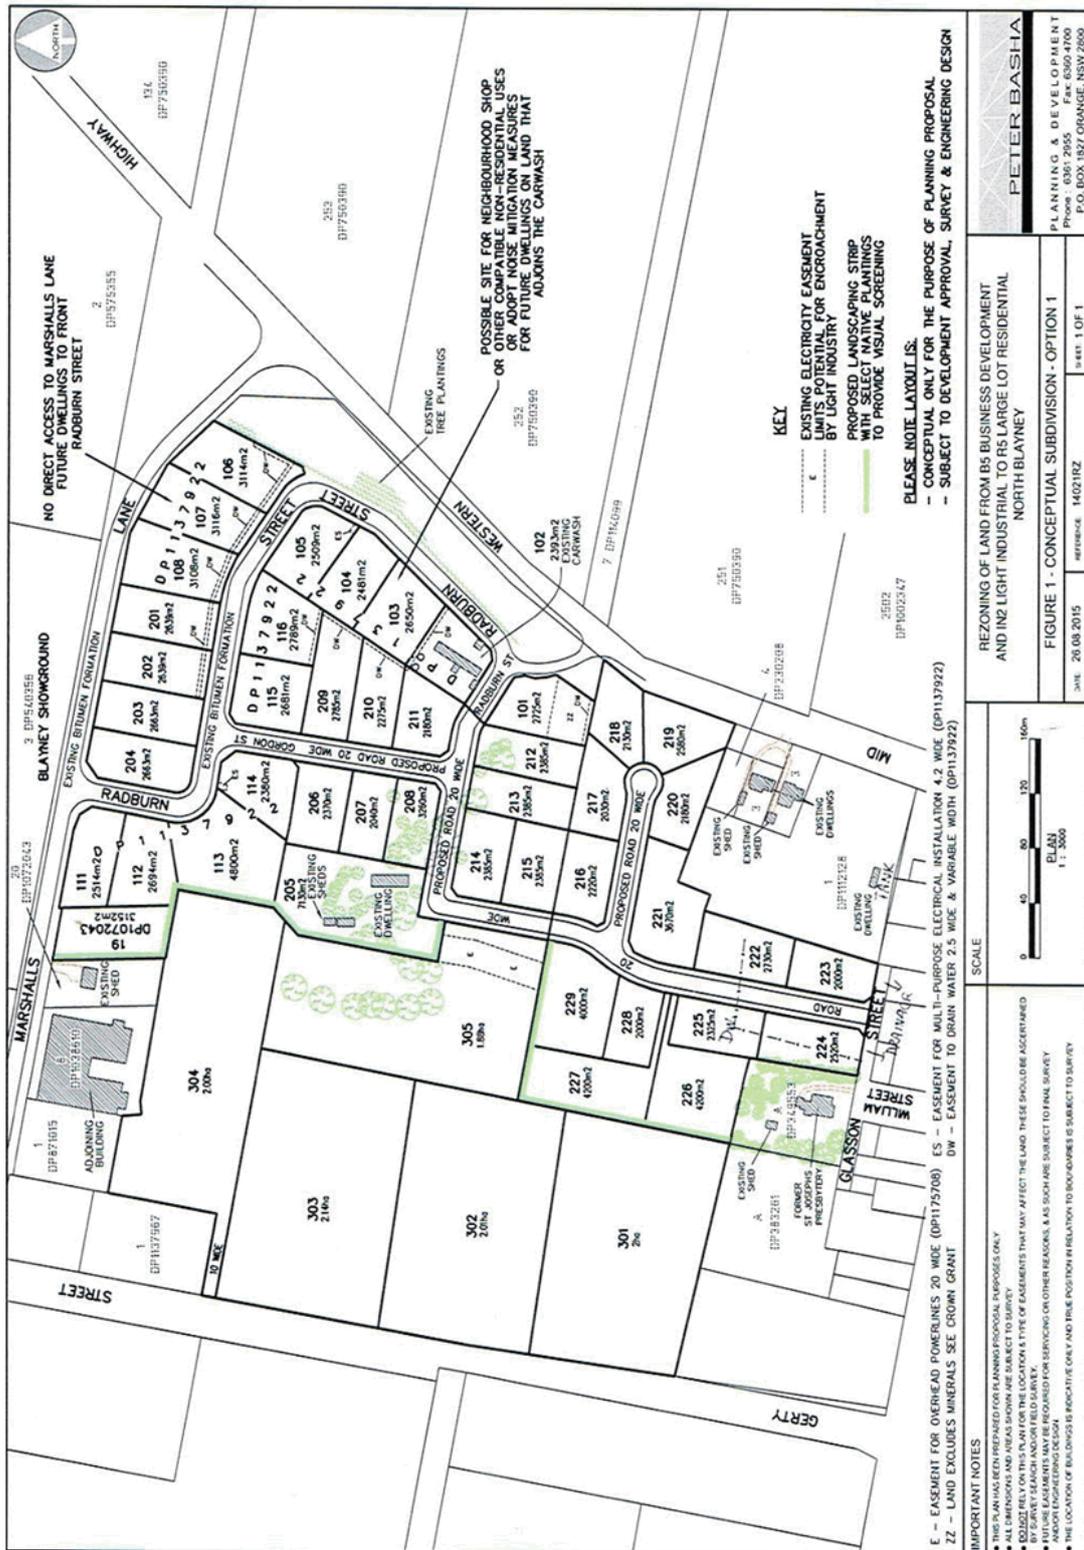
Trade Centre & Surrounds –Residential Proposal – Draft Subdivision Plan (2015)
